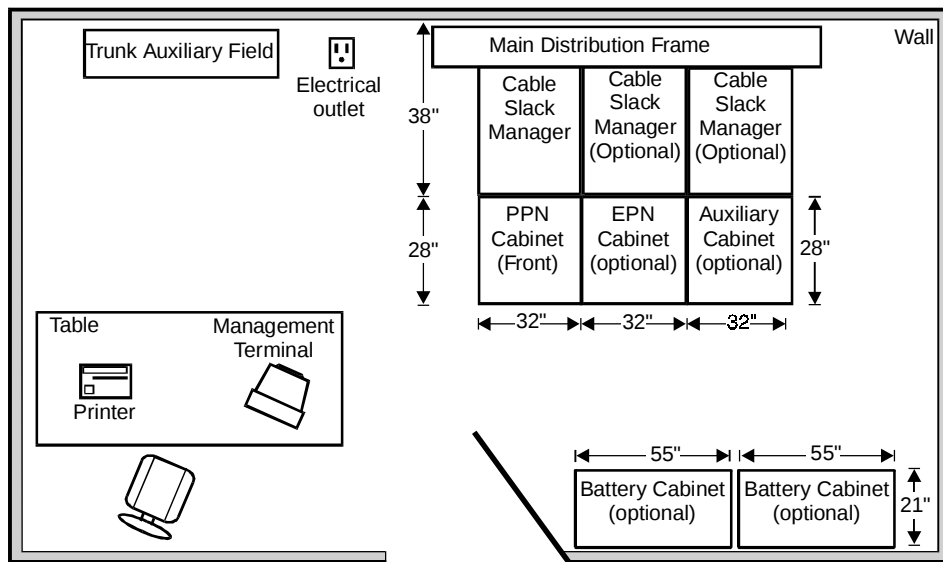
Typical Floorplan with EPN and Auxiliary Cabinet
